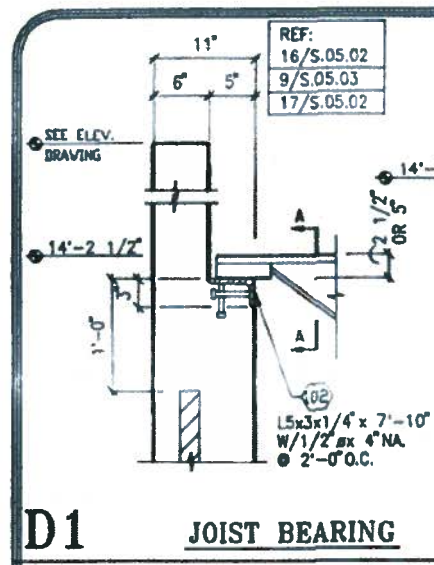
Top of east wall of outdoor recreation area (PDM Shop Drawing E10)
